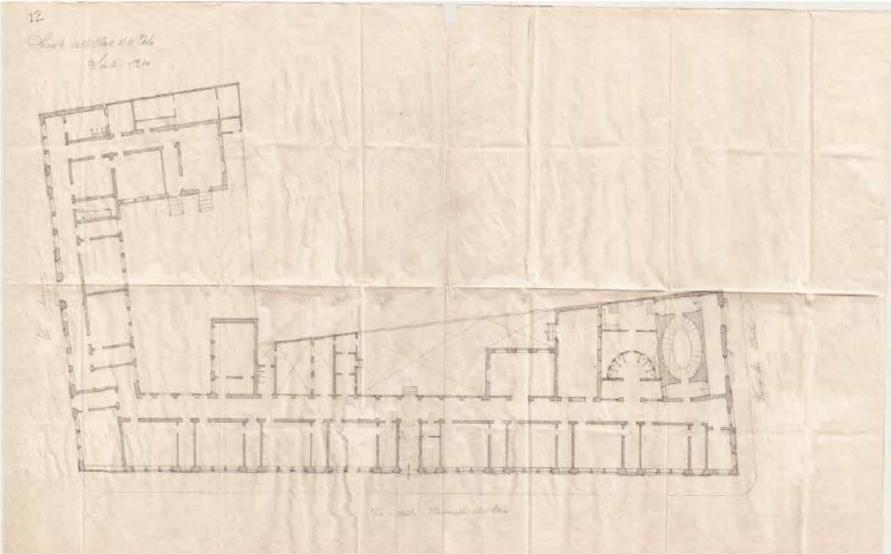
Plans of the building project, 1886-88 (Archivio Storico Capitolino, Rip VI).
